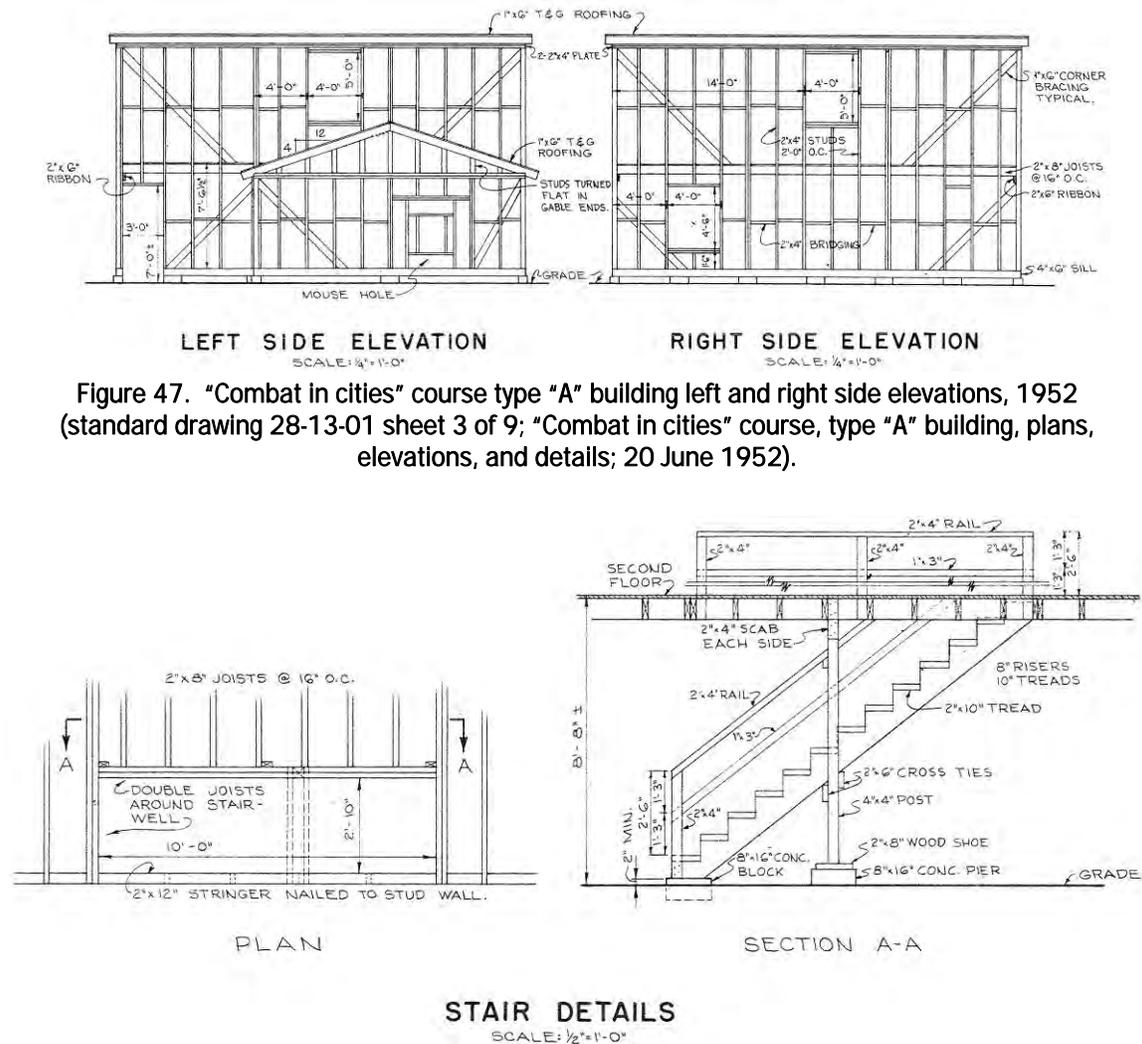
"Combat in cities" course type "A" building left and right side elevations, 1952 (standard drawing 28-13-01 sheet 3 of 9; "Combat in cities" course, type "A" building, plans, elevations, and details; 20 June 1952).
